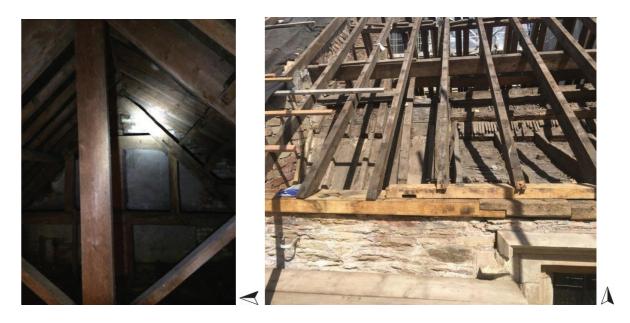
The original roof trusses still exist to the east of the western section of the attic.
